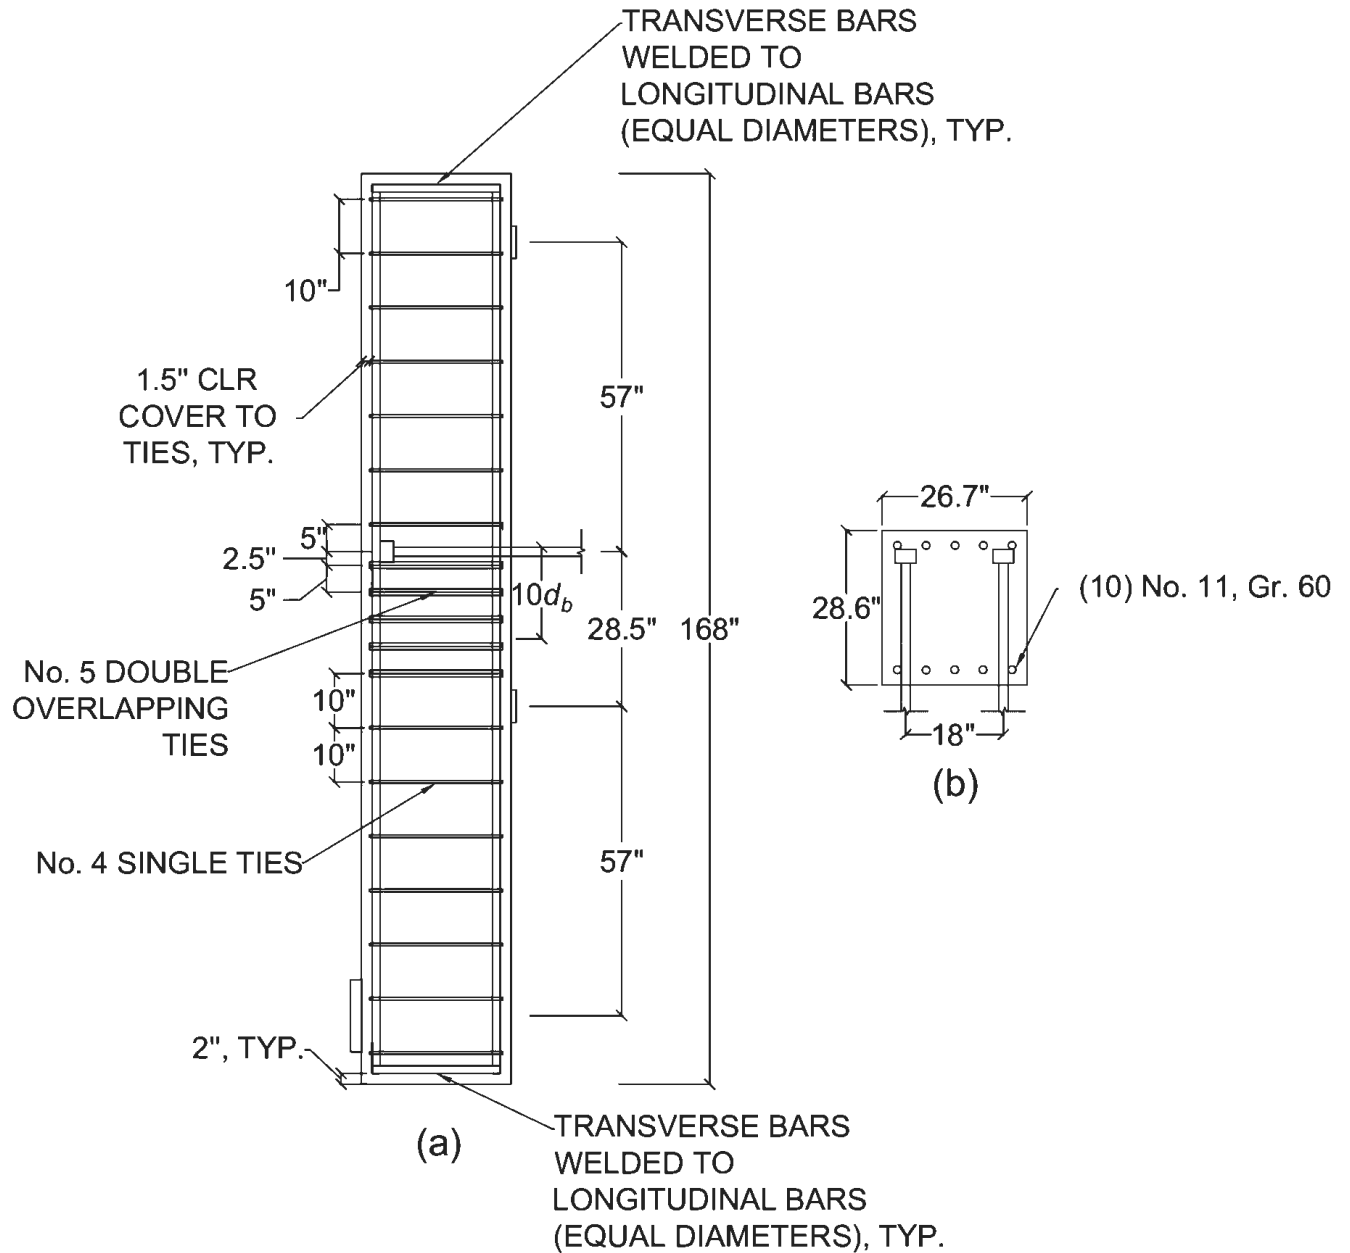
Details of reinforcement layout for No. 14 headed bar specimen 14-16D: (a) elevation, (b) cross-section
